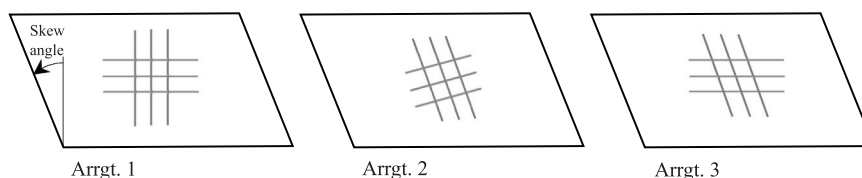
Typical reinforcement arrangements for skew slabs and skew angle convention.
